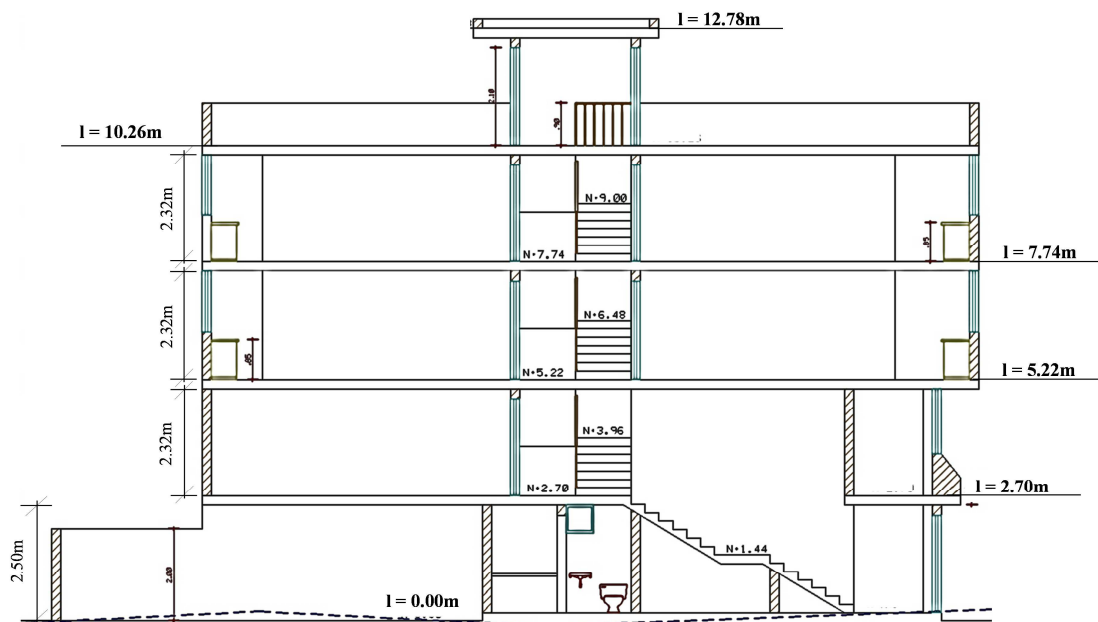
Longitudinal section of the building “Sr. Washington Calahorrano”
